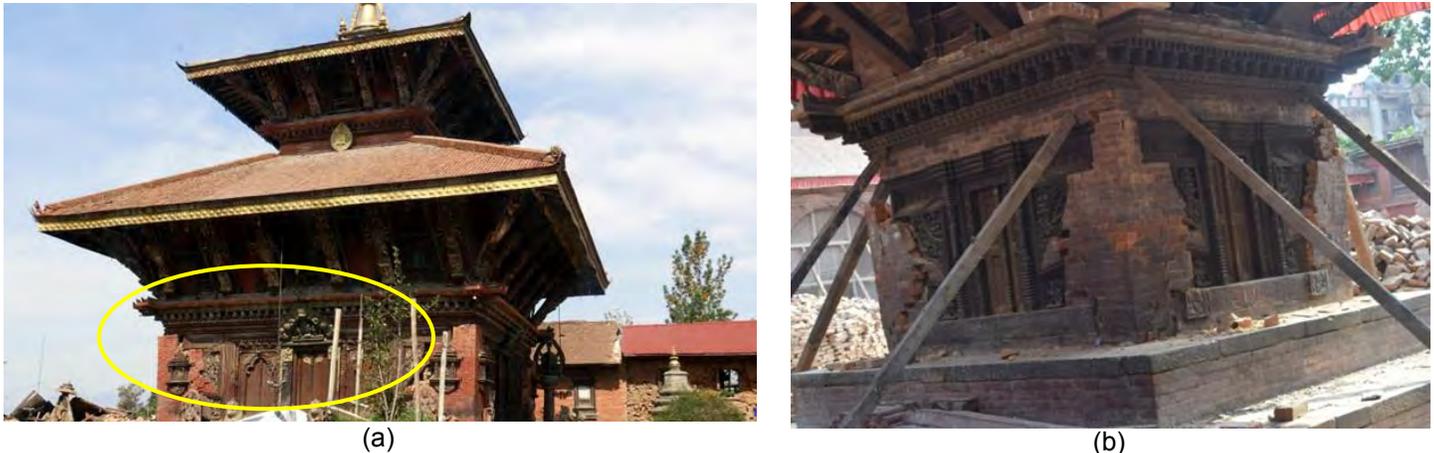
Temples supported by timber structures with brick masonry infill performed better than pure masonry structures: (a) Changu Narayan Temple, and (b) a temple in Kathmandu Durbar Square (photos and annotations: Suraj Shrestha).
